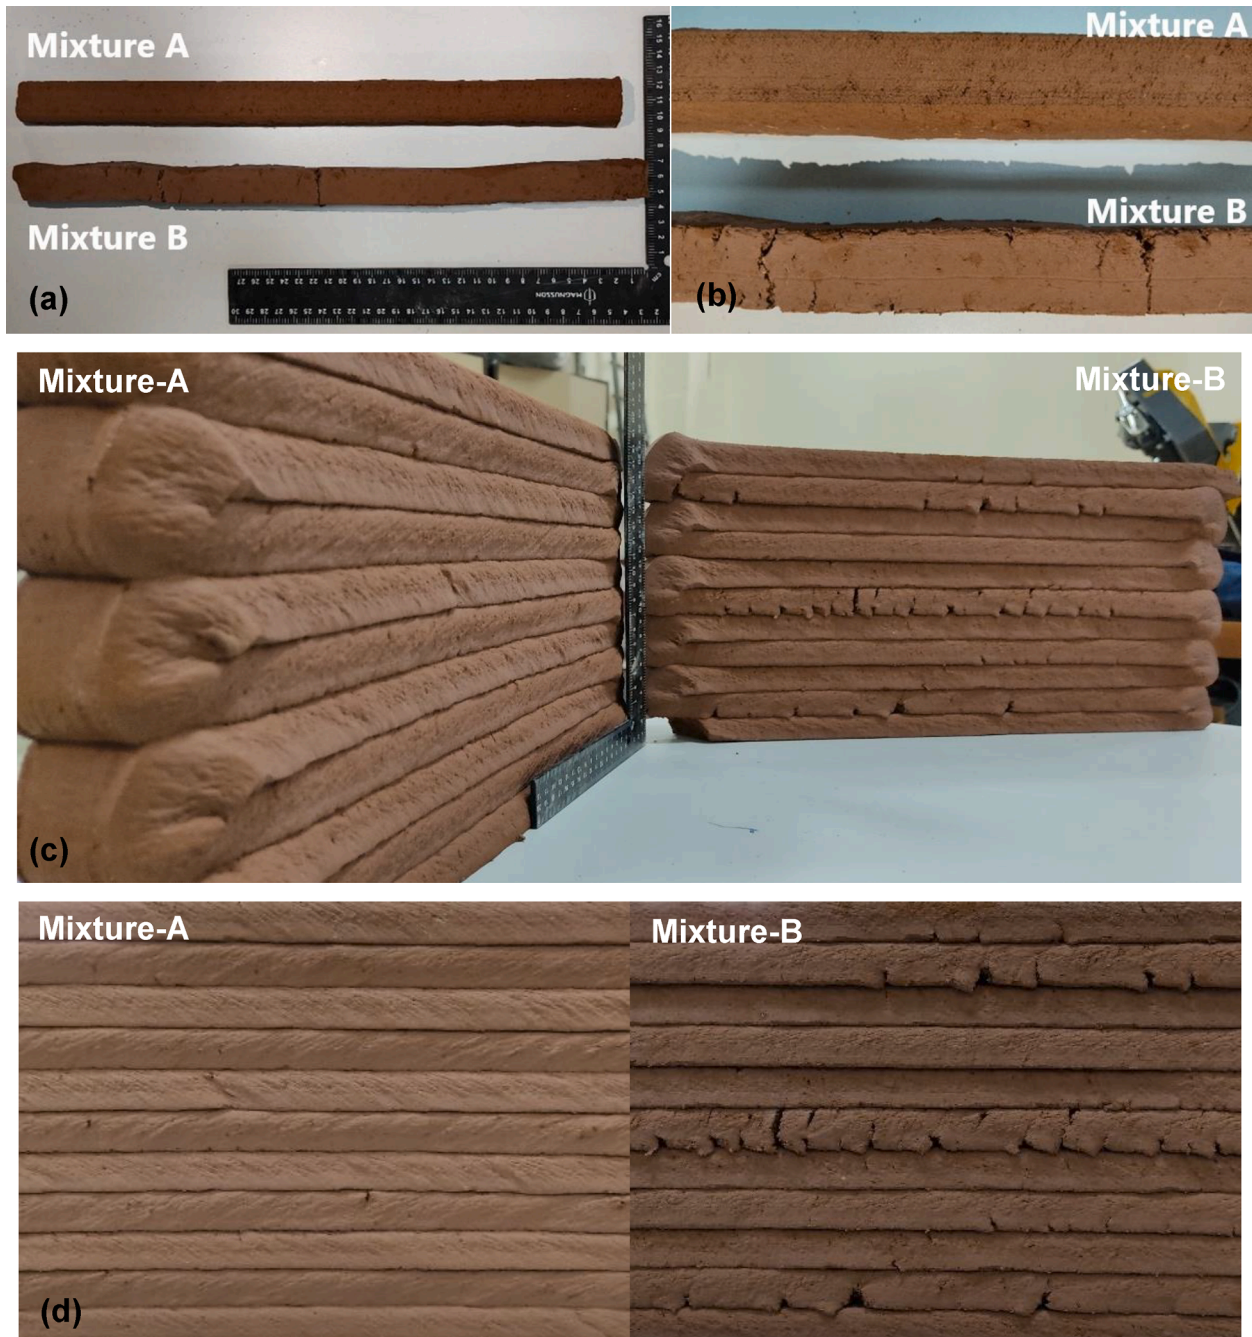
(a) General, (b) close-up view of single-layer specimens of 3D printed geopolymer mortar mixtures showing the defects and (c) general, (d) close-up views of multi-layer specimens of 3D printed geopolymer mixtures.
